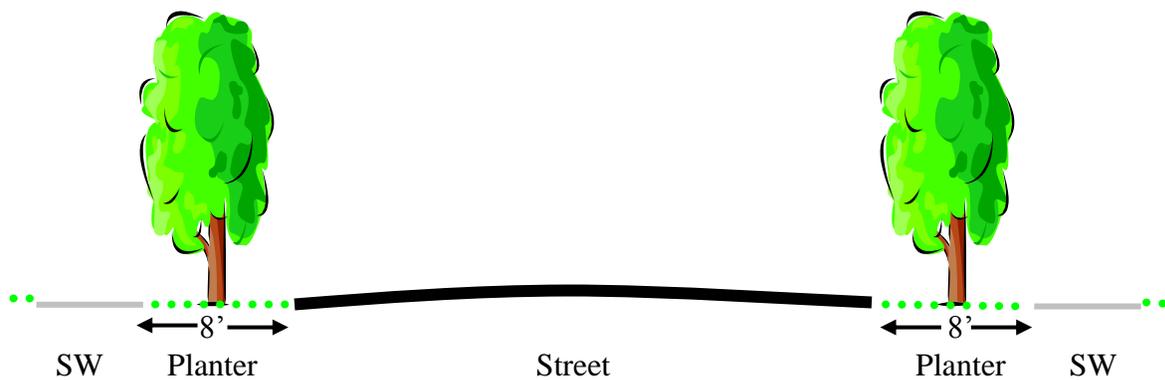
When space does not allow development of a full median, providing 8' planter strips will allow development of large, canopy forming trees. Planter strips should not be less than 6' wide. These narrow widths will only allow planting of small to medium sized trees that will not produce the canopy effect.
